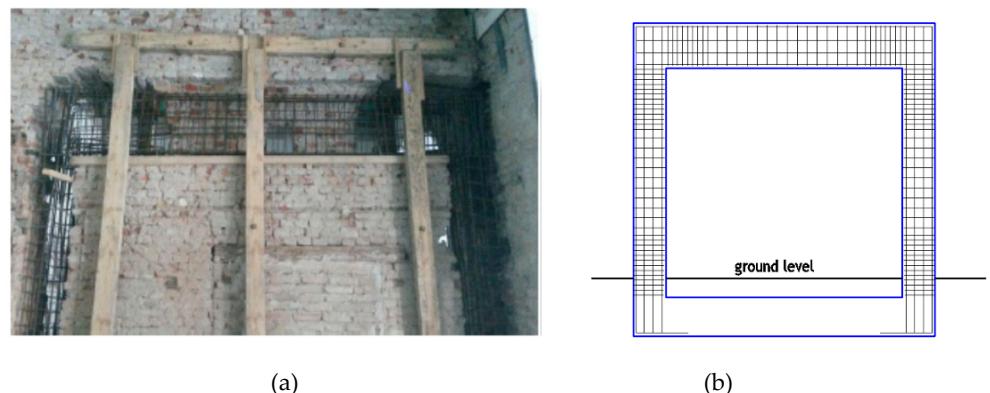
New RC frames were constructed as a part of the seismic retrofitting of the Diocese in Pančevo: (a) formwork and scaffolding arrangement and (b) frame reinforcement detailing.
